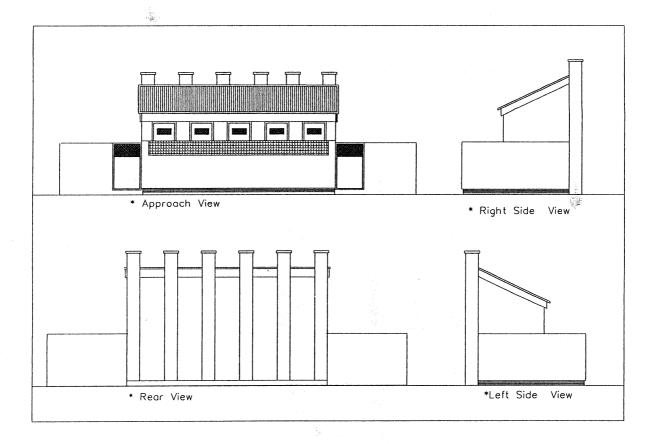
Elevations of the 5 compartment VIP latrine, urinals and hand washing facilities (Combined Facility)
